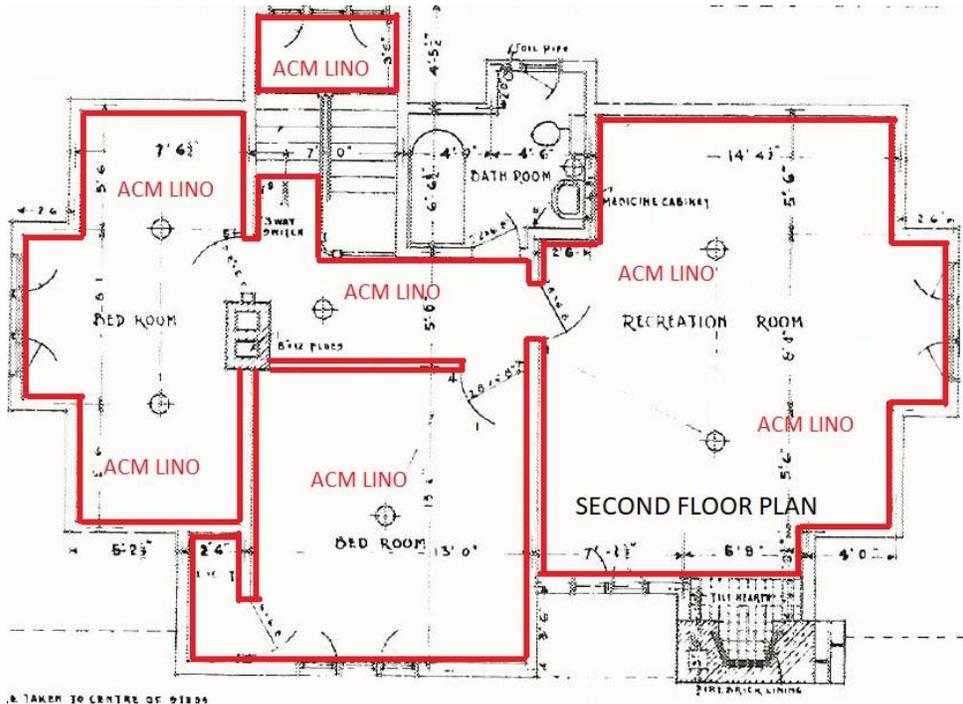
Second Floor Plot Plan – Asbestos Linoleum Flooring
